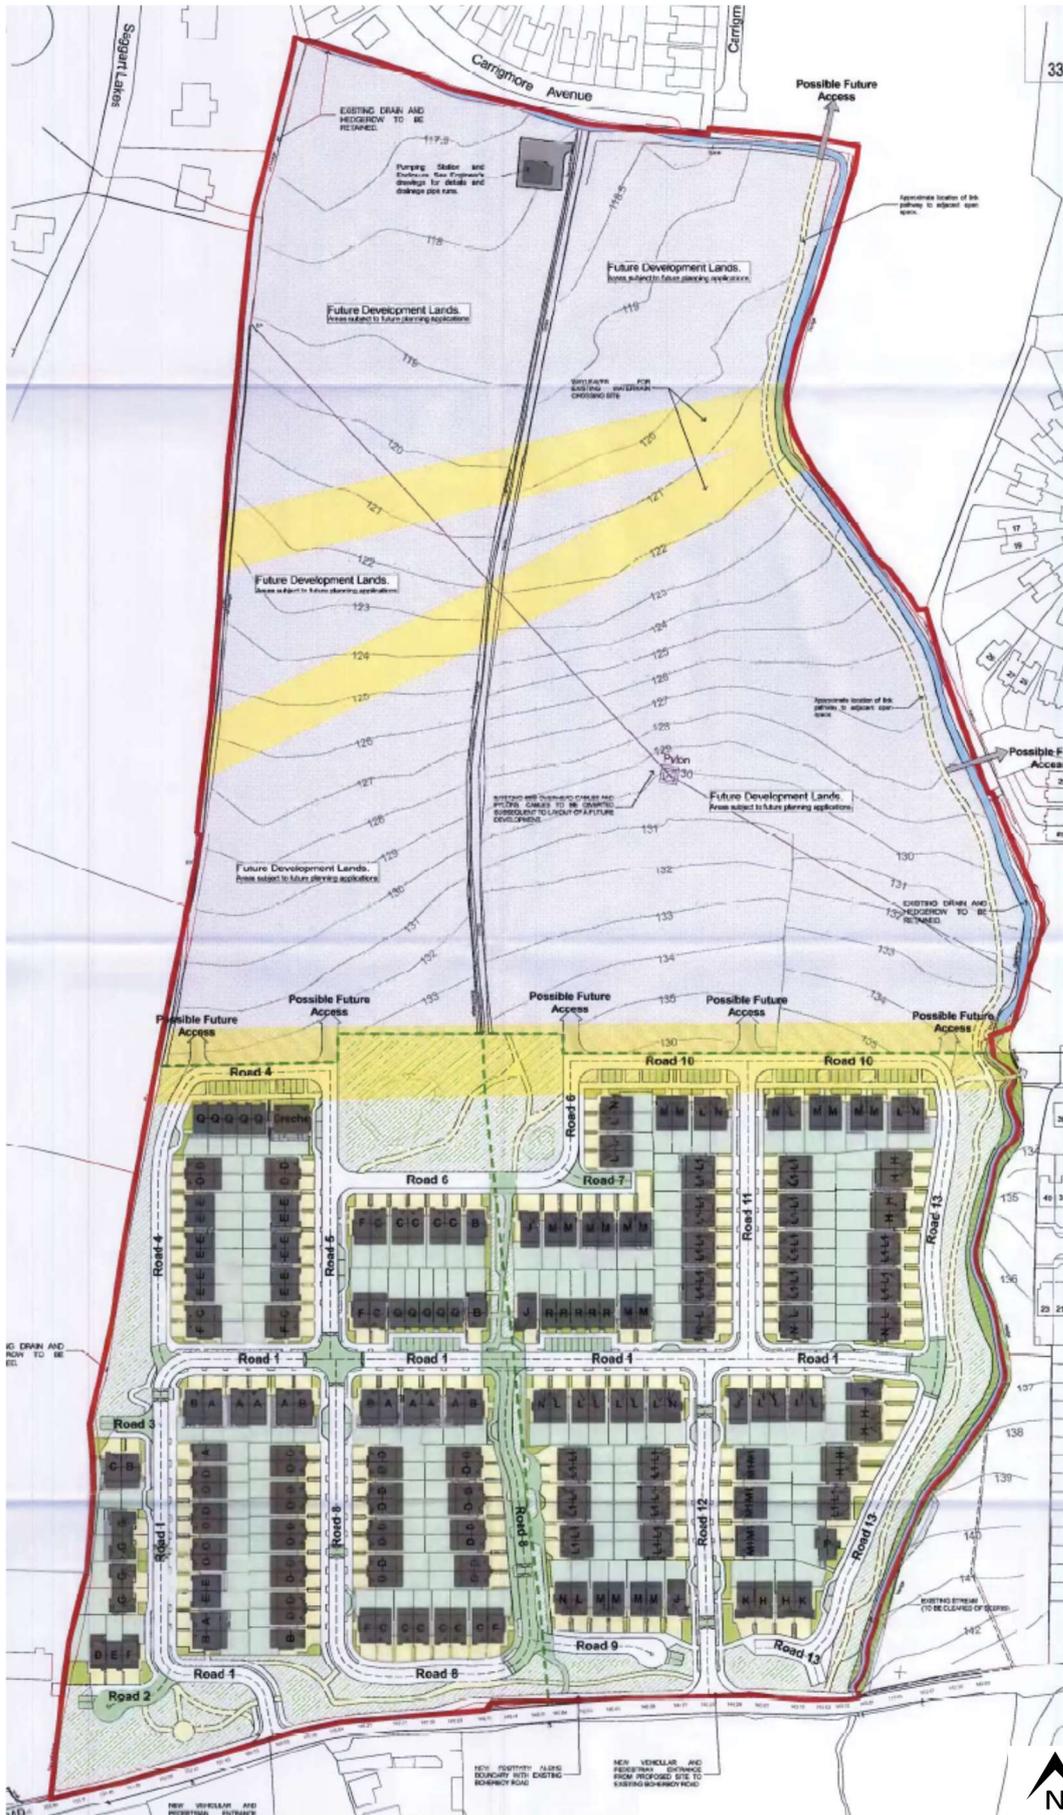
Previously proposed Site Layout Plan Ref. SD15A/0388 & PL06S.247074
